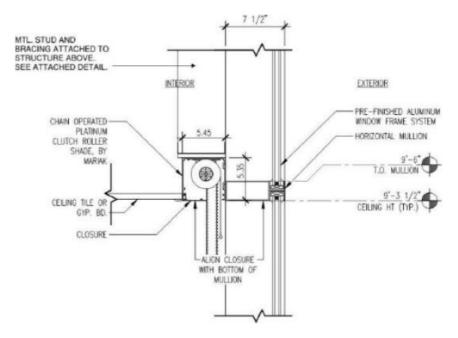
Condition 1b: TI ceiling elevation matches exterior window mullion elevation – Double Shade
